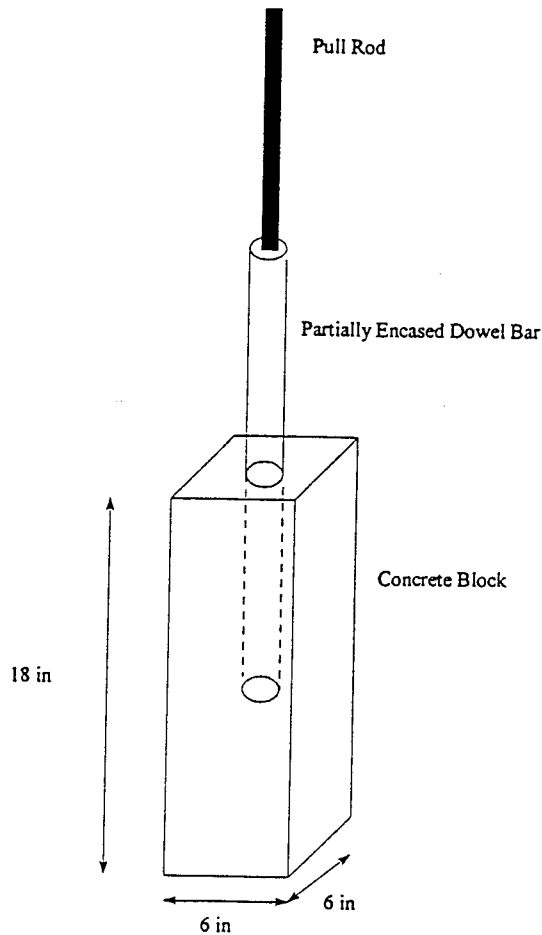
Schematic Illustration of Pull-out Test Specimens
